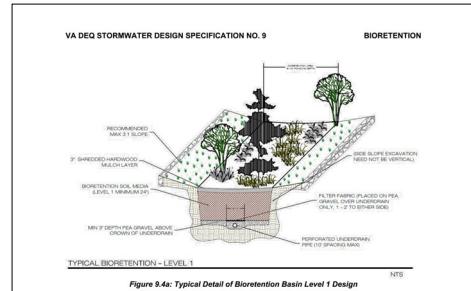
Typical Detail of Bioretention Basin Level 1 Design
